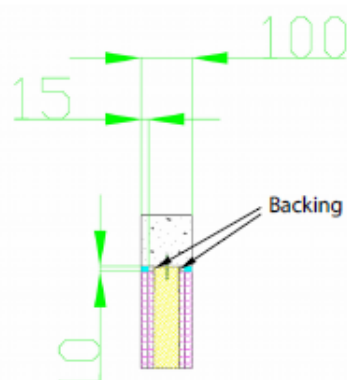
wall gypsum to stone thickness  $\geq 75$  mm
